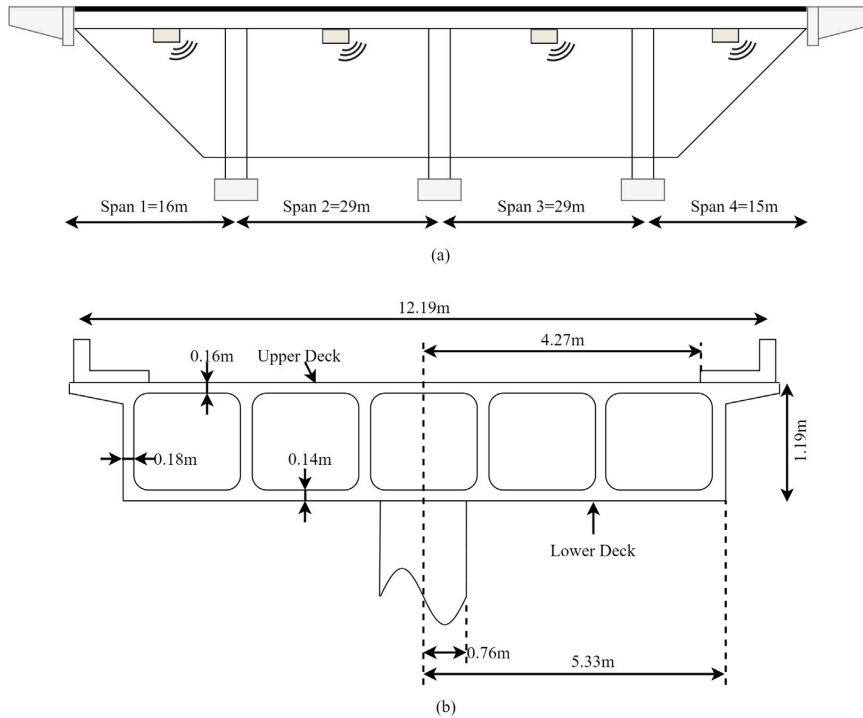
Voigt Drive/I-5 Bridge; (a) Multi-span bridge model; (b) Cross-section.
